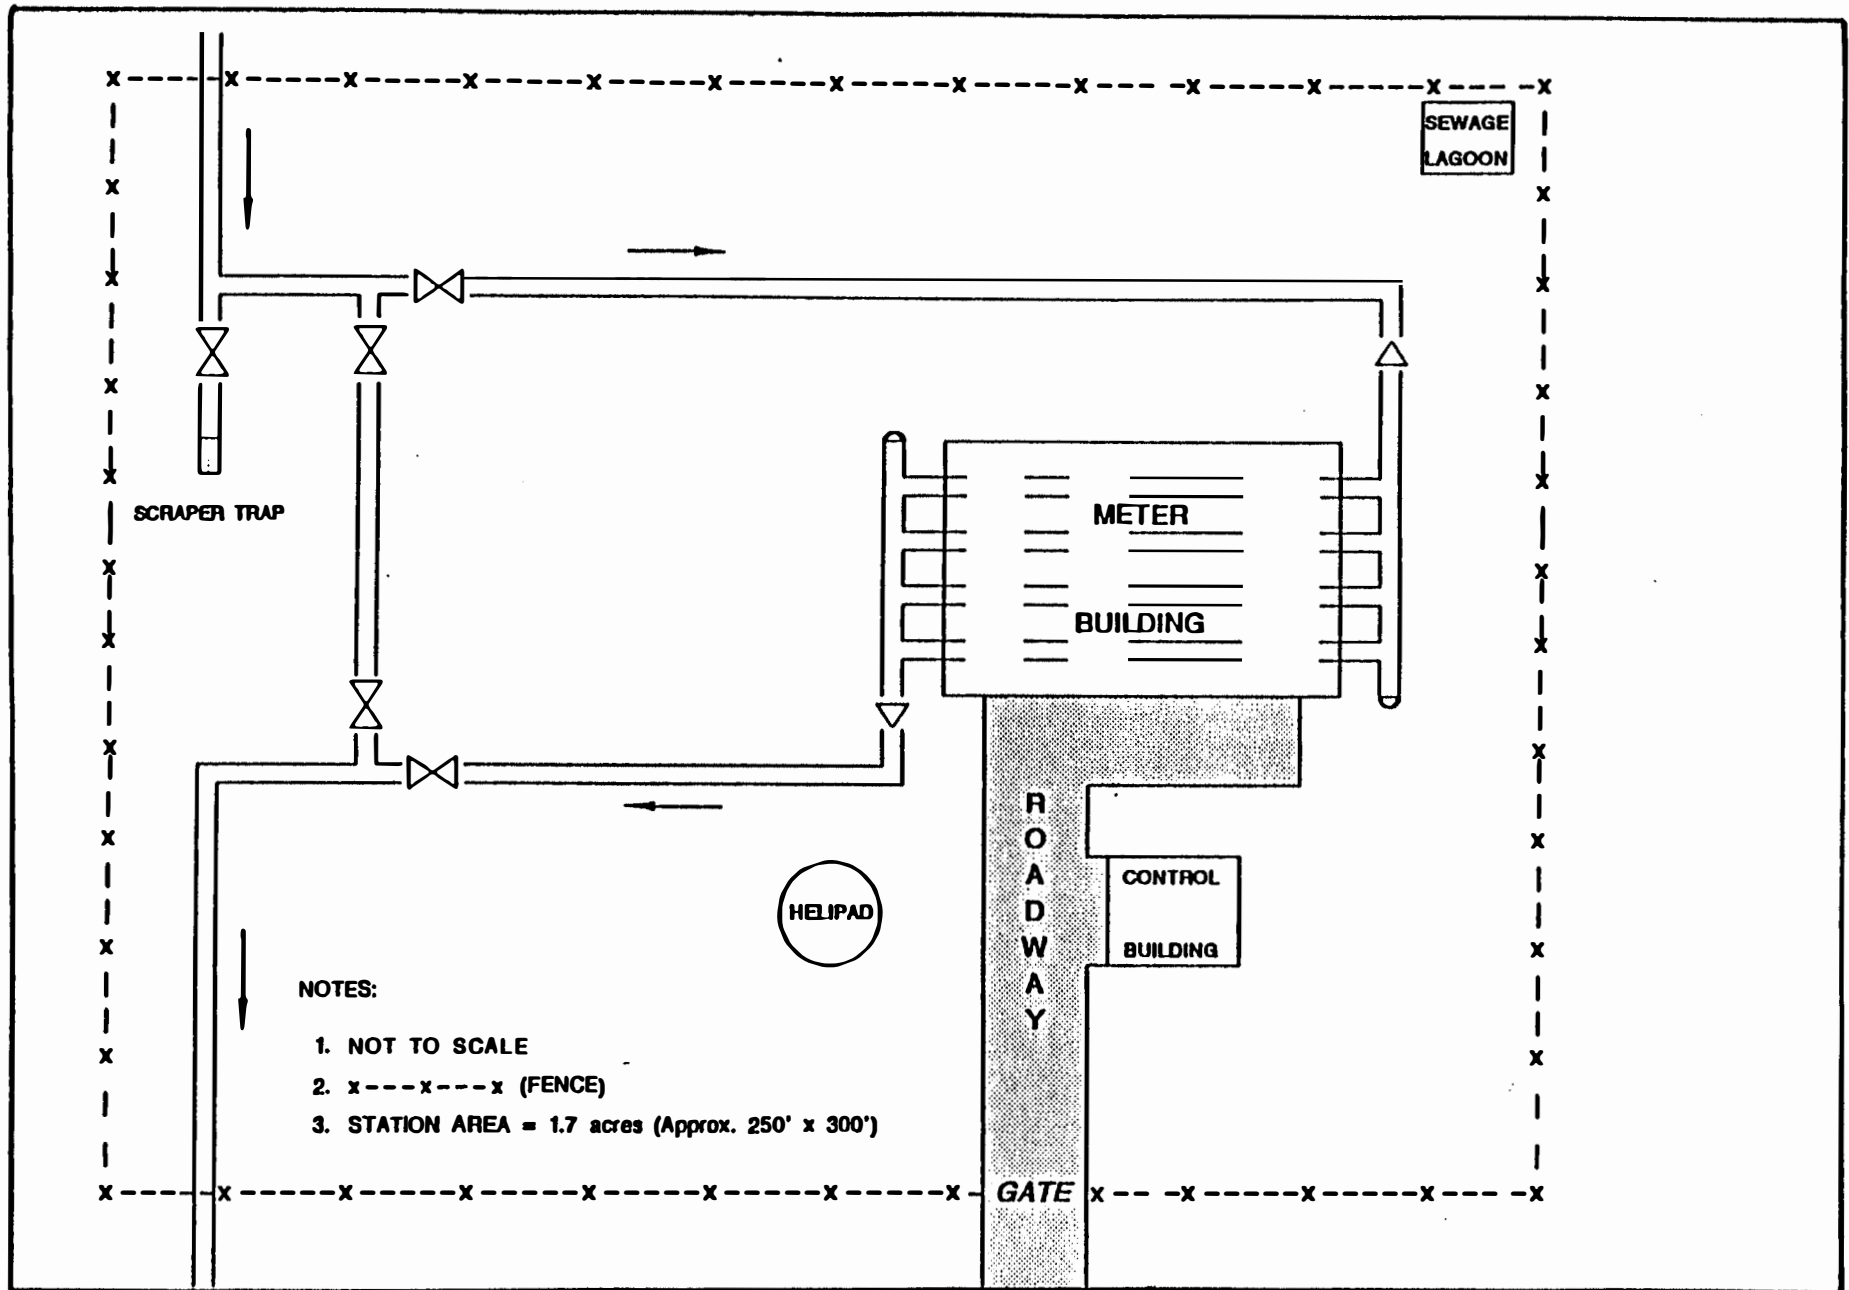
PROPOSED PLOT PLAN OPAL METERING STATION (Opal, Wyoming)
